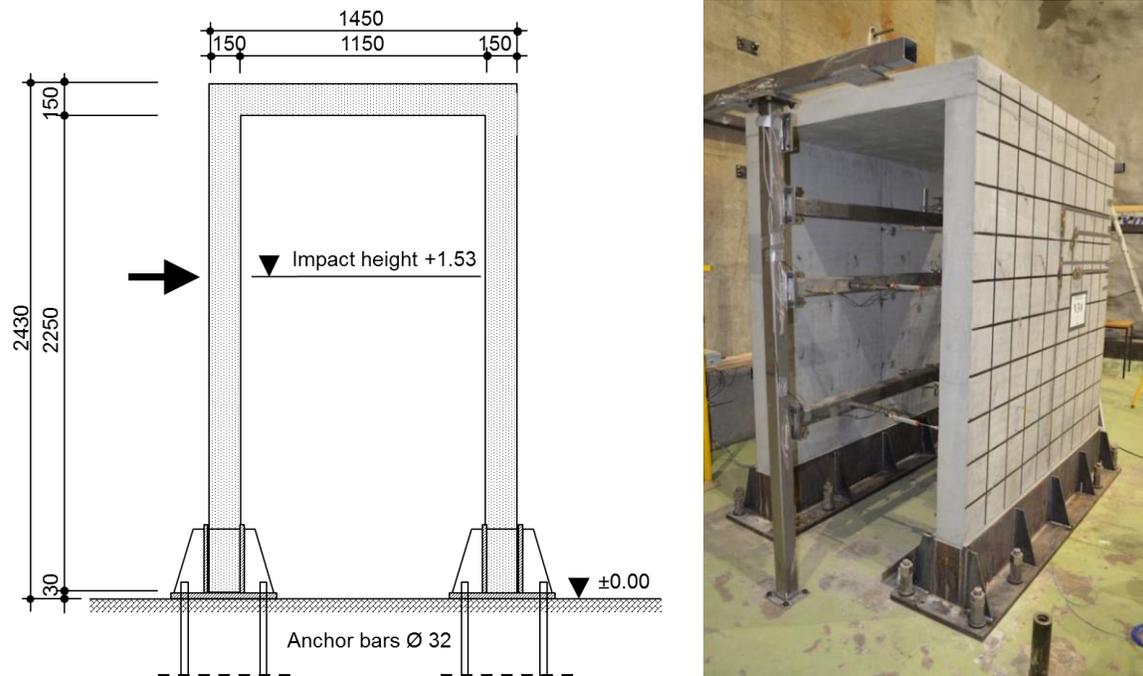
Side view (left) and photo of the mock-up of test V3 with supporting structure (right)
